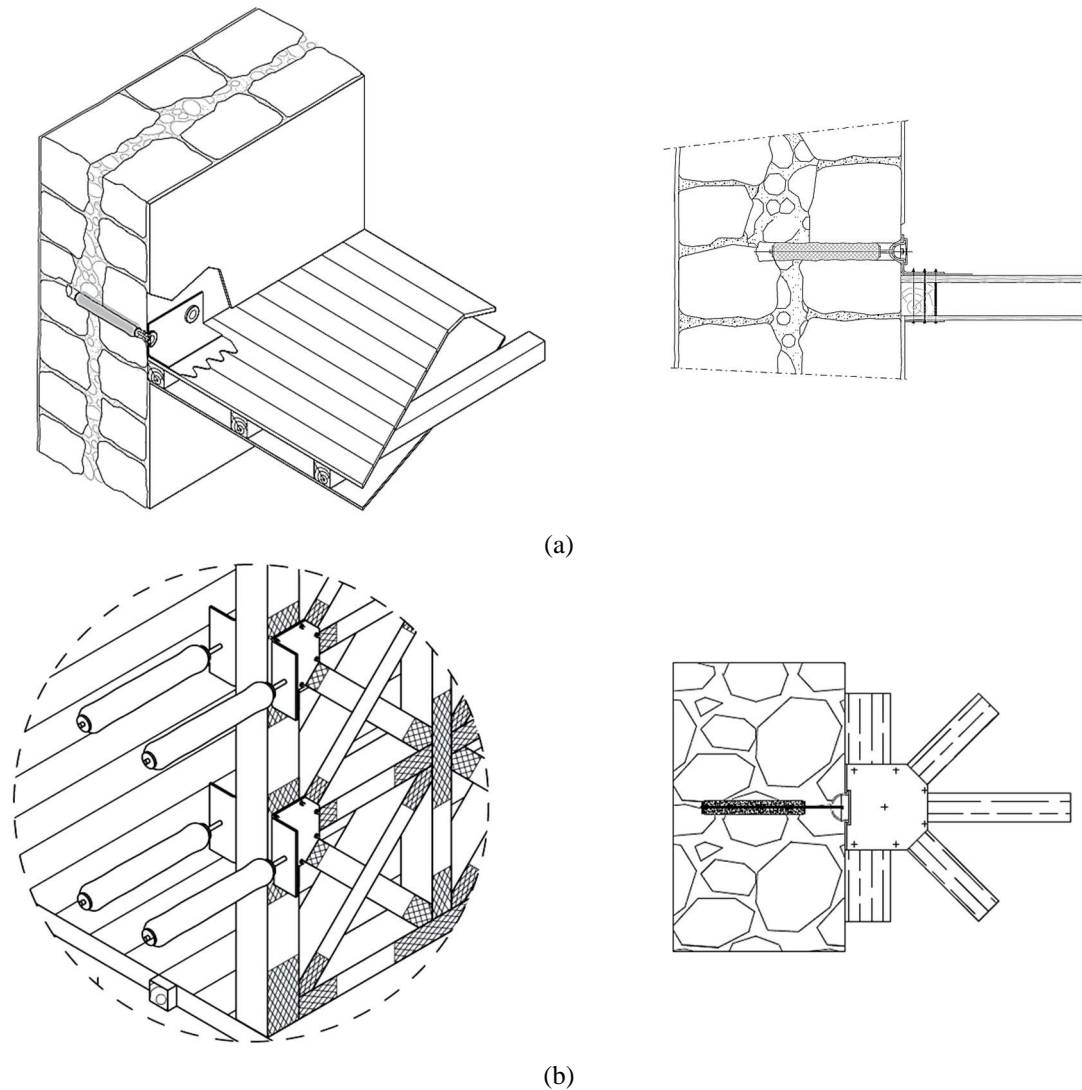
Strengthening techniques using injected anchors for the connection between structural elements: (a) Wall to floor connection; (b) Wall to half-timber-wall connection (Moreira et al. 2012).
